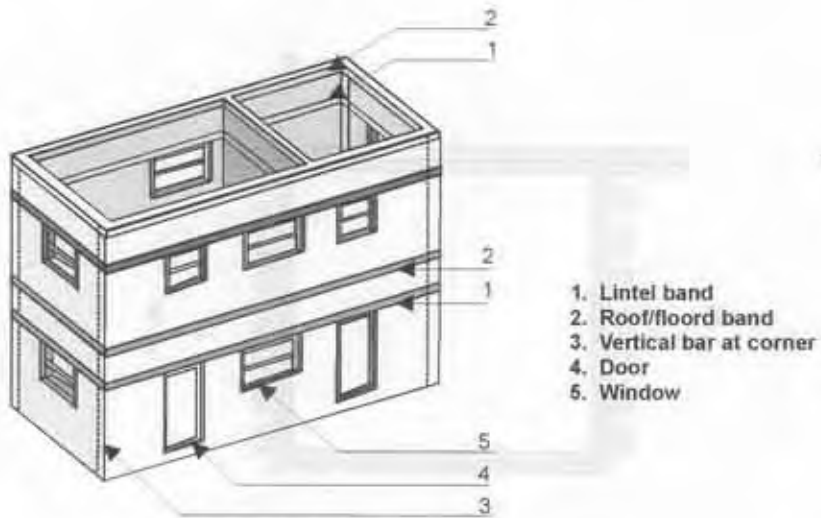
B Overall arrangement of reinforcing in masonry double storey building
